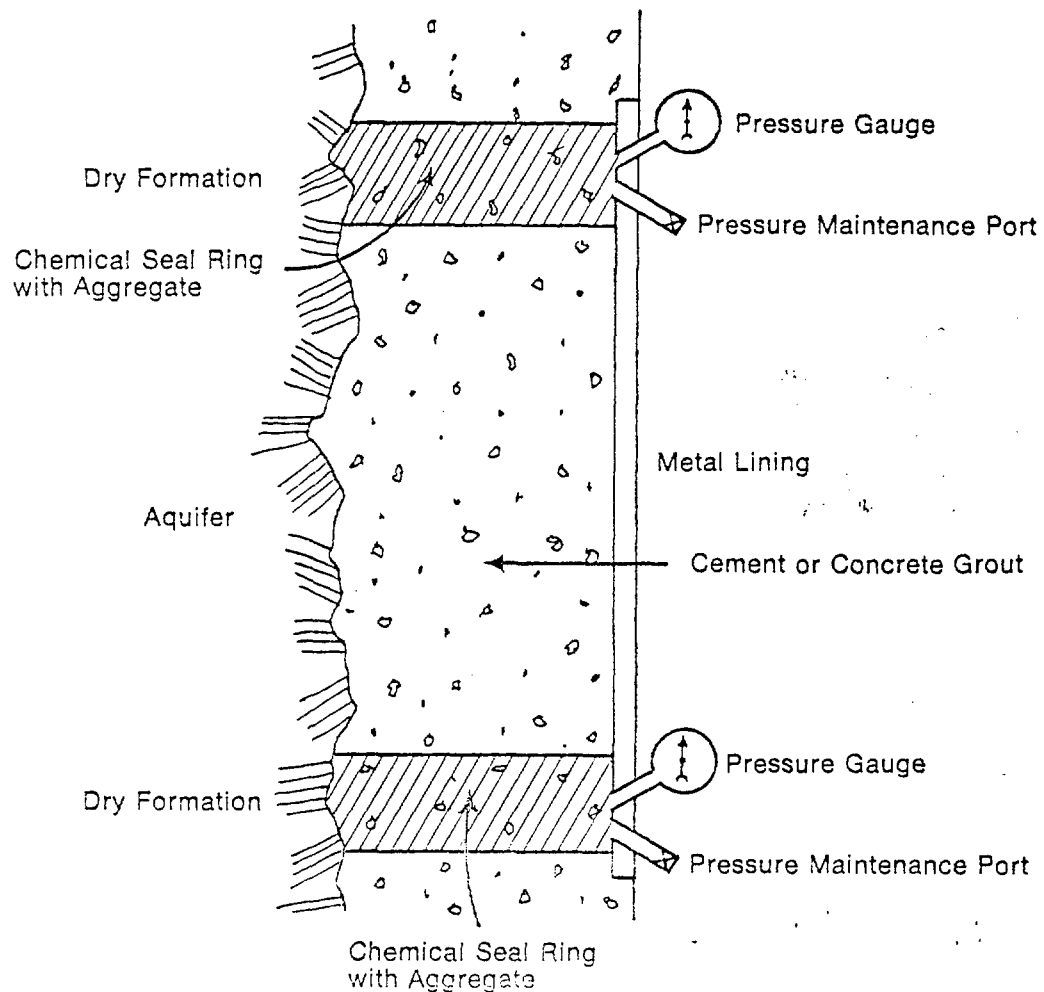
Schematic drawing of a seal assembly in a sunken shaft.
